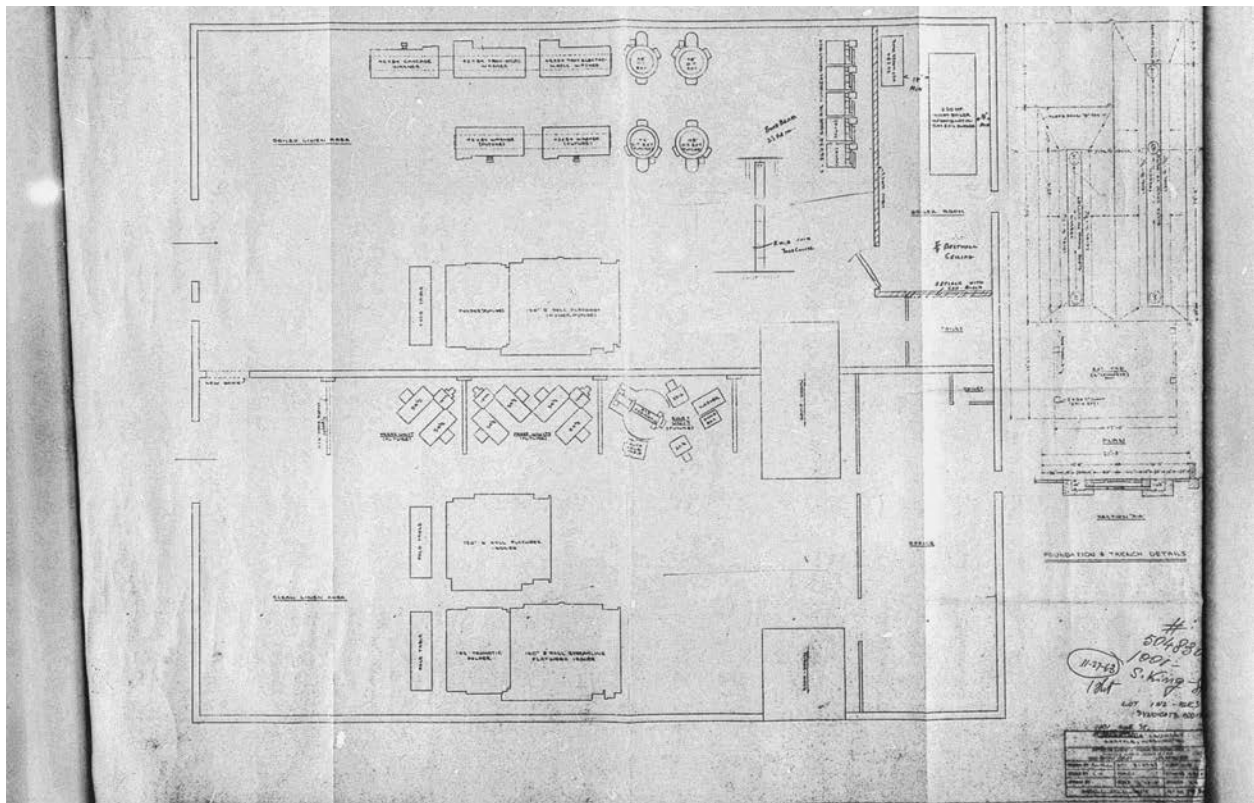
1001-1005 S. King Street - Laundry Plans (11/27/63)
